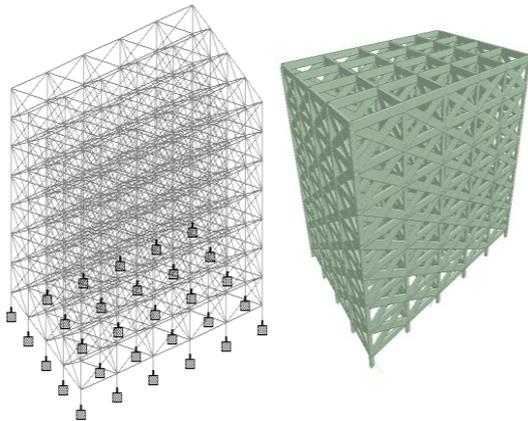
3D View of G+6 Frame with Infill wall Structure
